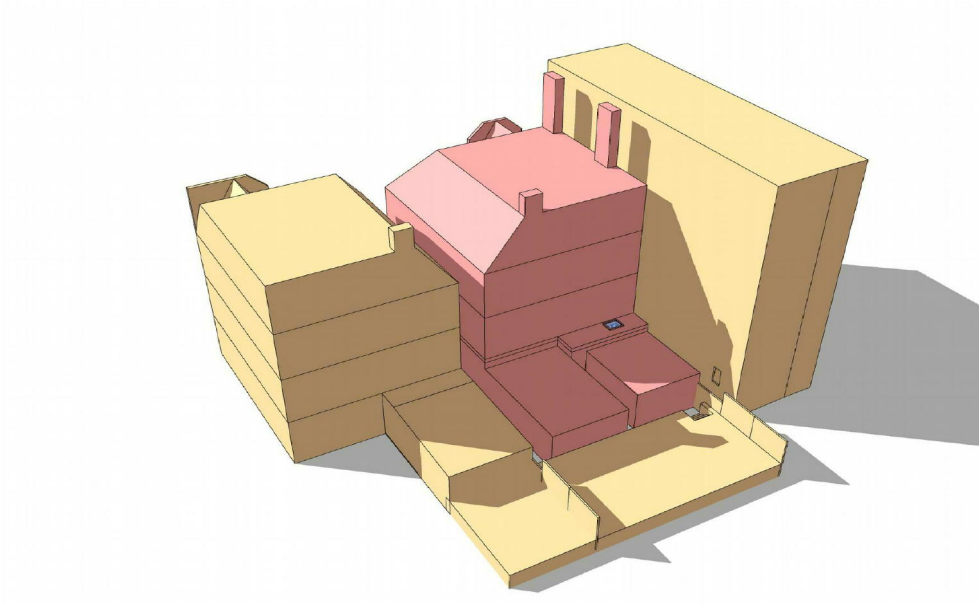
As proposed 3D model viewed from East with shadows set to 12pm, 21st March.
